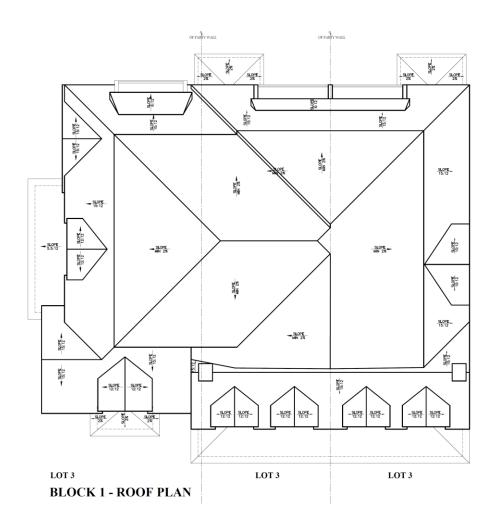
Block 1 Roof Plan, Sheet A5 (FBP Architects Inc., September 1, 2023)
